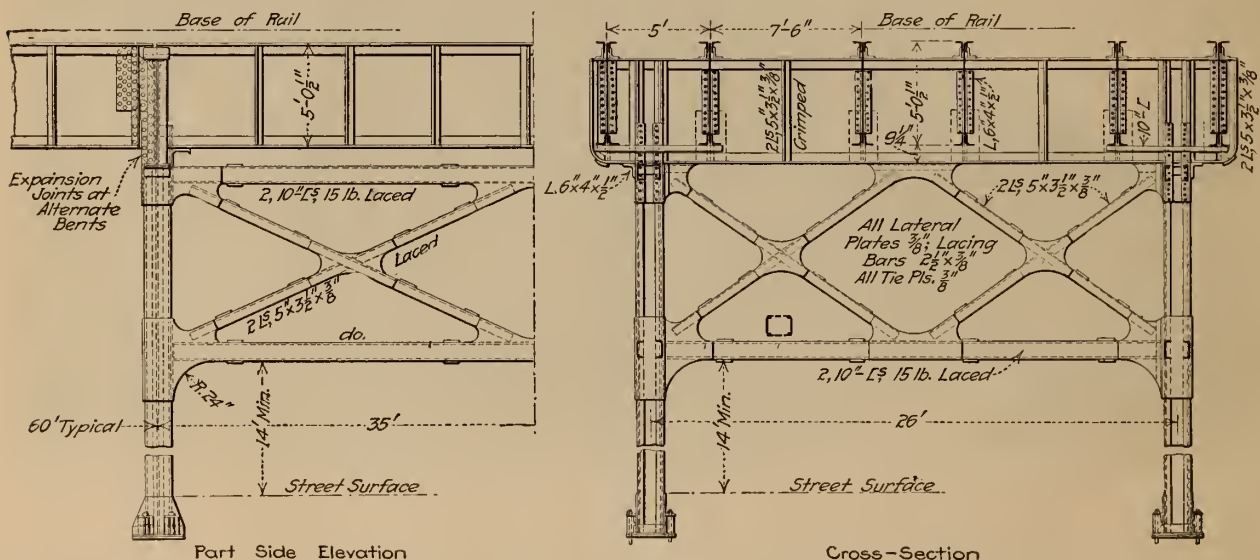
TOWER CONSTRUCTION, USED FOR HEIGHTS OVER 30 FT.
